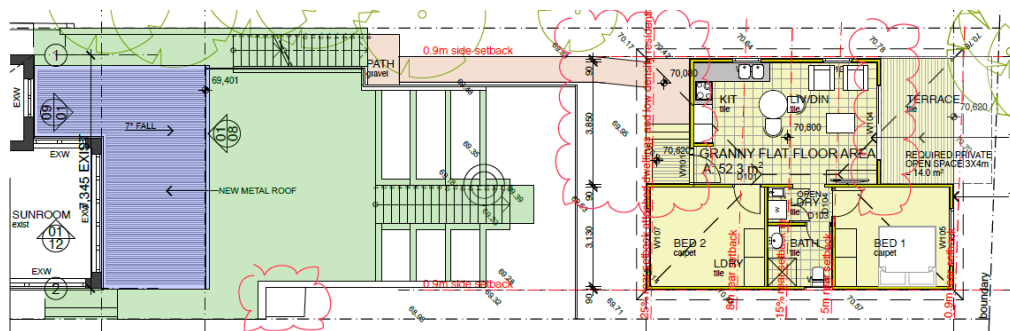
Refused secondary dwelling ground floor plan under DA/665/2022 (Source: Fortly & Grant Architecture Pty Ltd)
